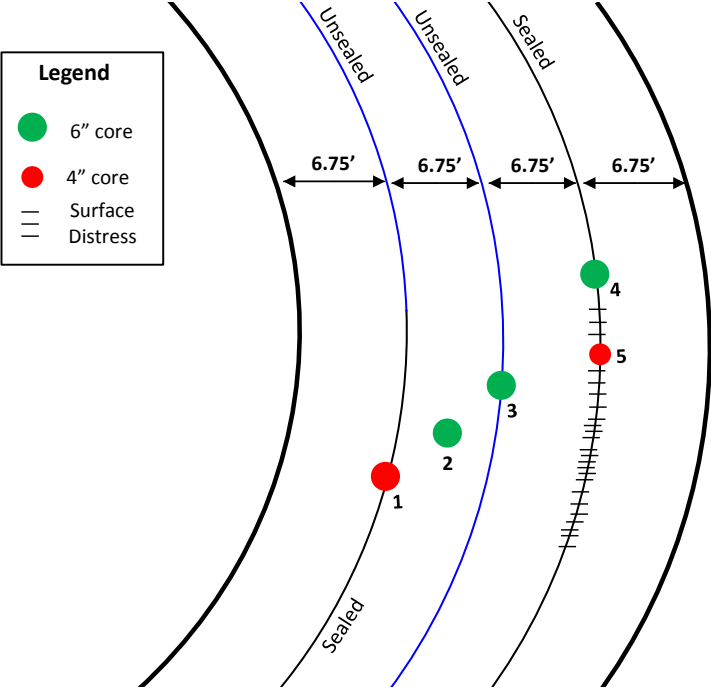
Plan view of coring and distressed locations on South Loop Drive (not to scale)
